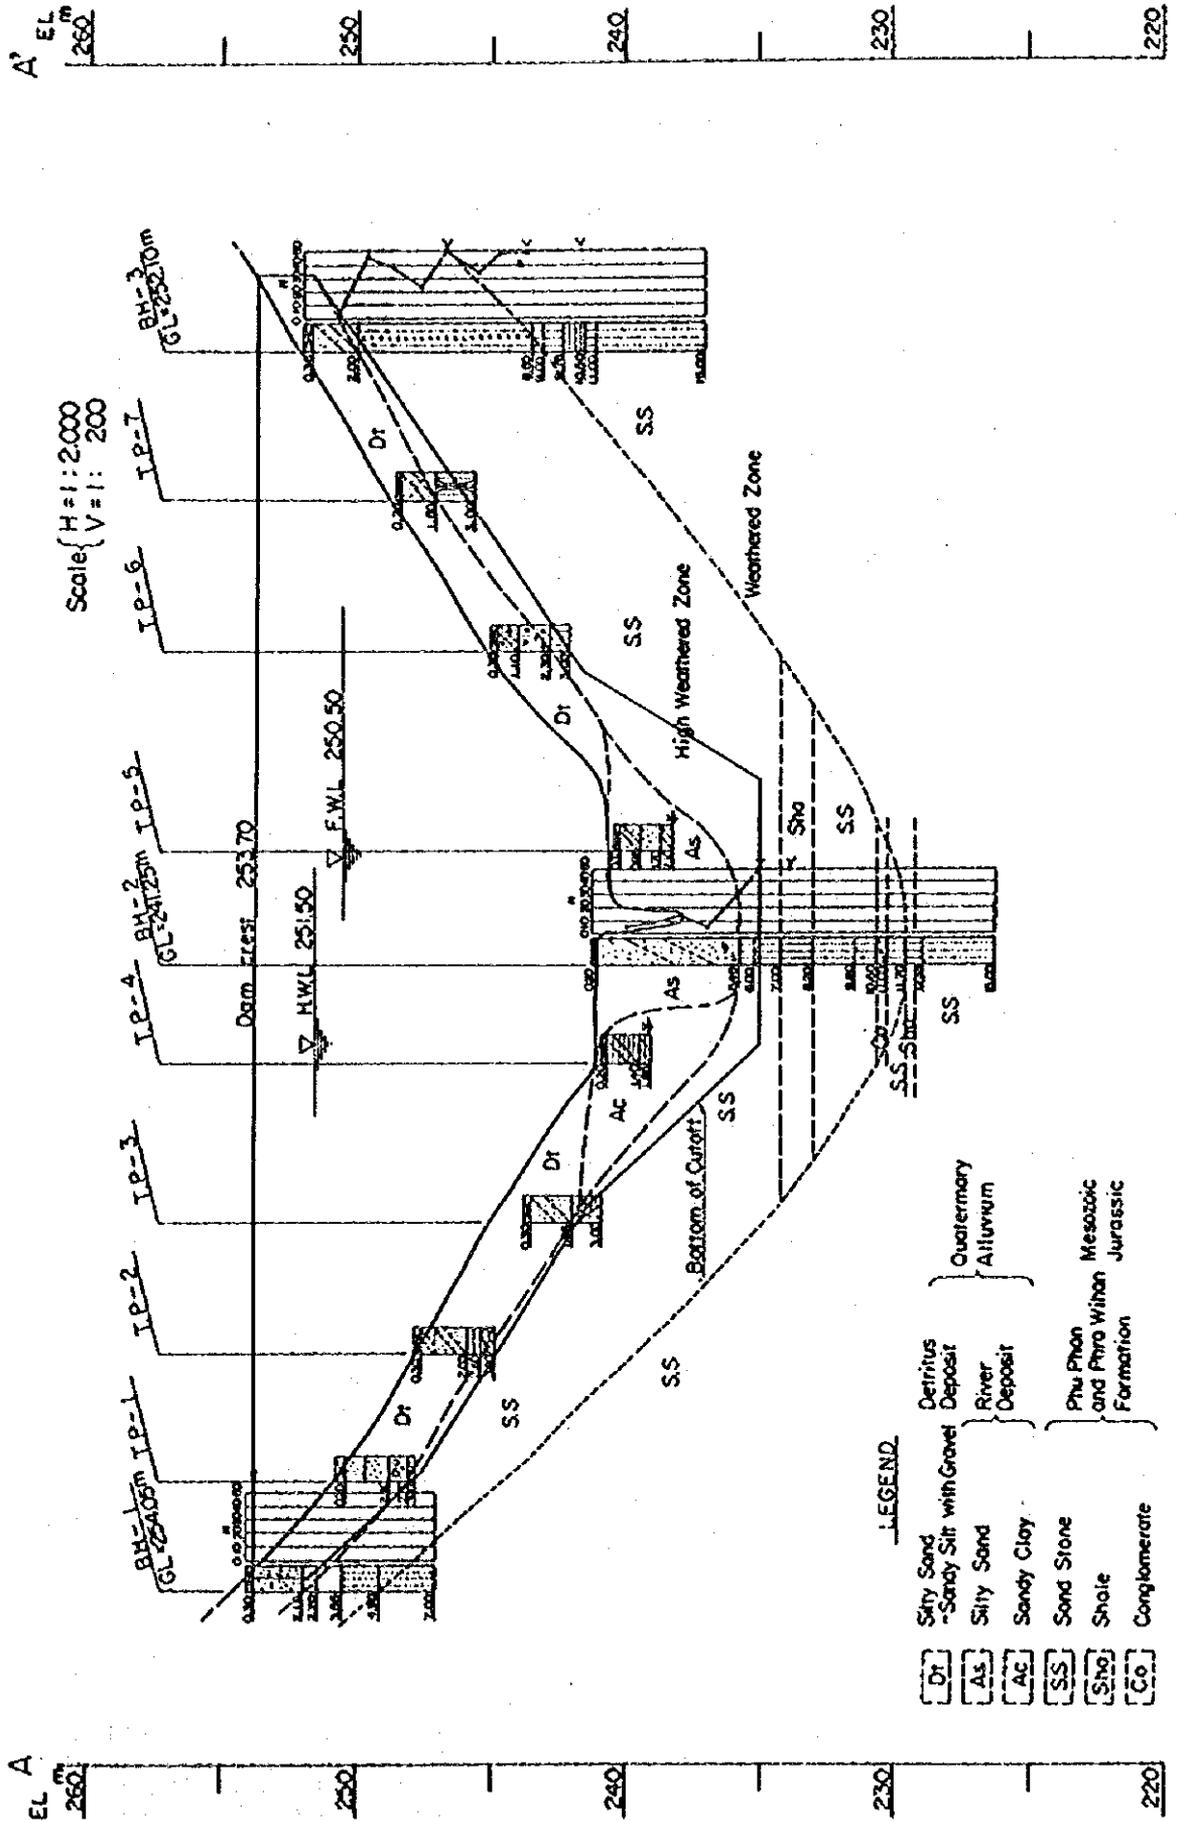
Typical Section (Meh Kah Dam)
